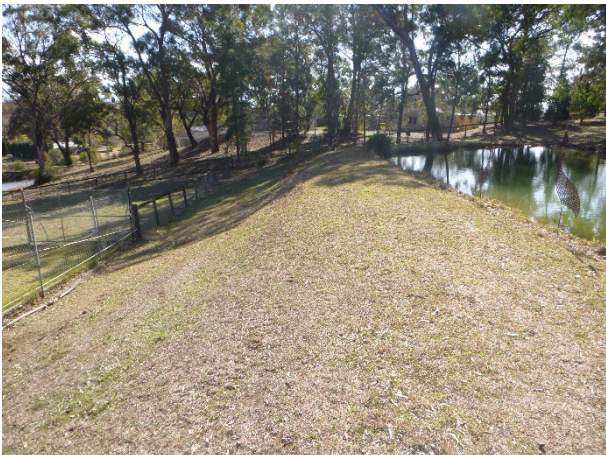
Dam Wall. Taken at 010 degrees on 23 August 2017.
